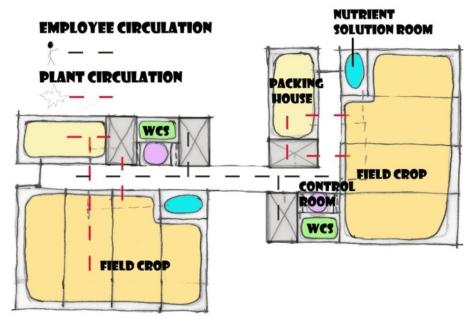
Plan sketch showing human and plant circulation, and spaces organization in typical floor plan
